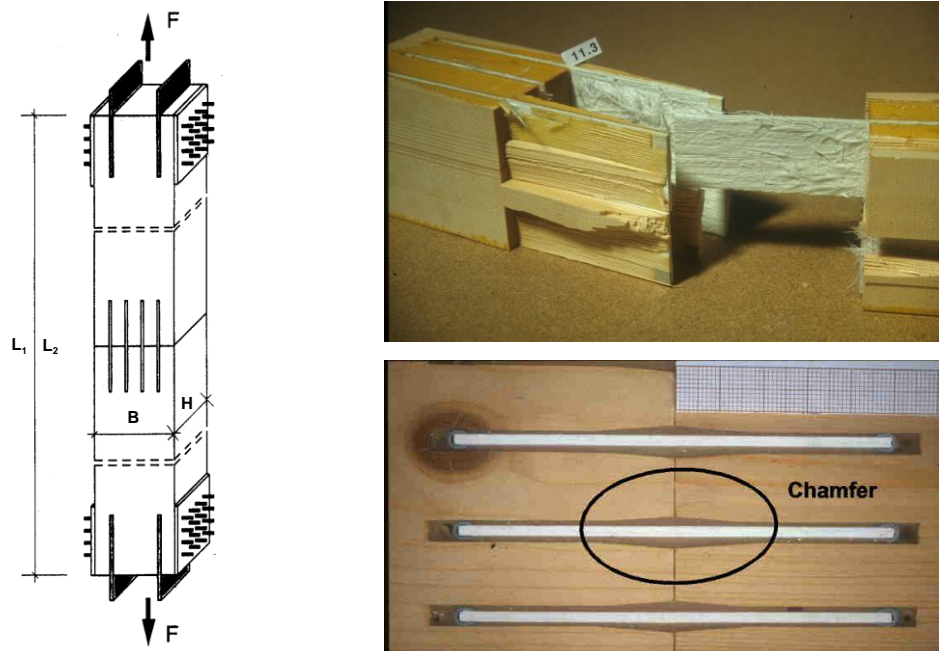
Tensile tests on glued-laminated GFRP-spliced specimens in structural sizes (stress concentration was reduced by enlarging the width of the groove near the end of the member; this increased the strength of the connection by as much as 25%) (Steiger 2014).
